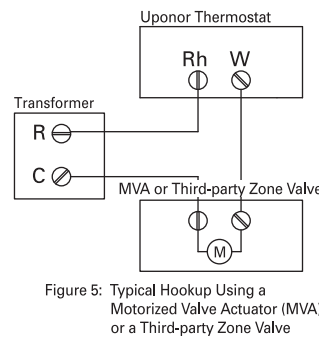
Typical Hookup Using a Motorized Valve Actuator (MVA) or a Third-party Zone Valve
